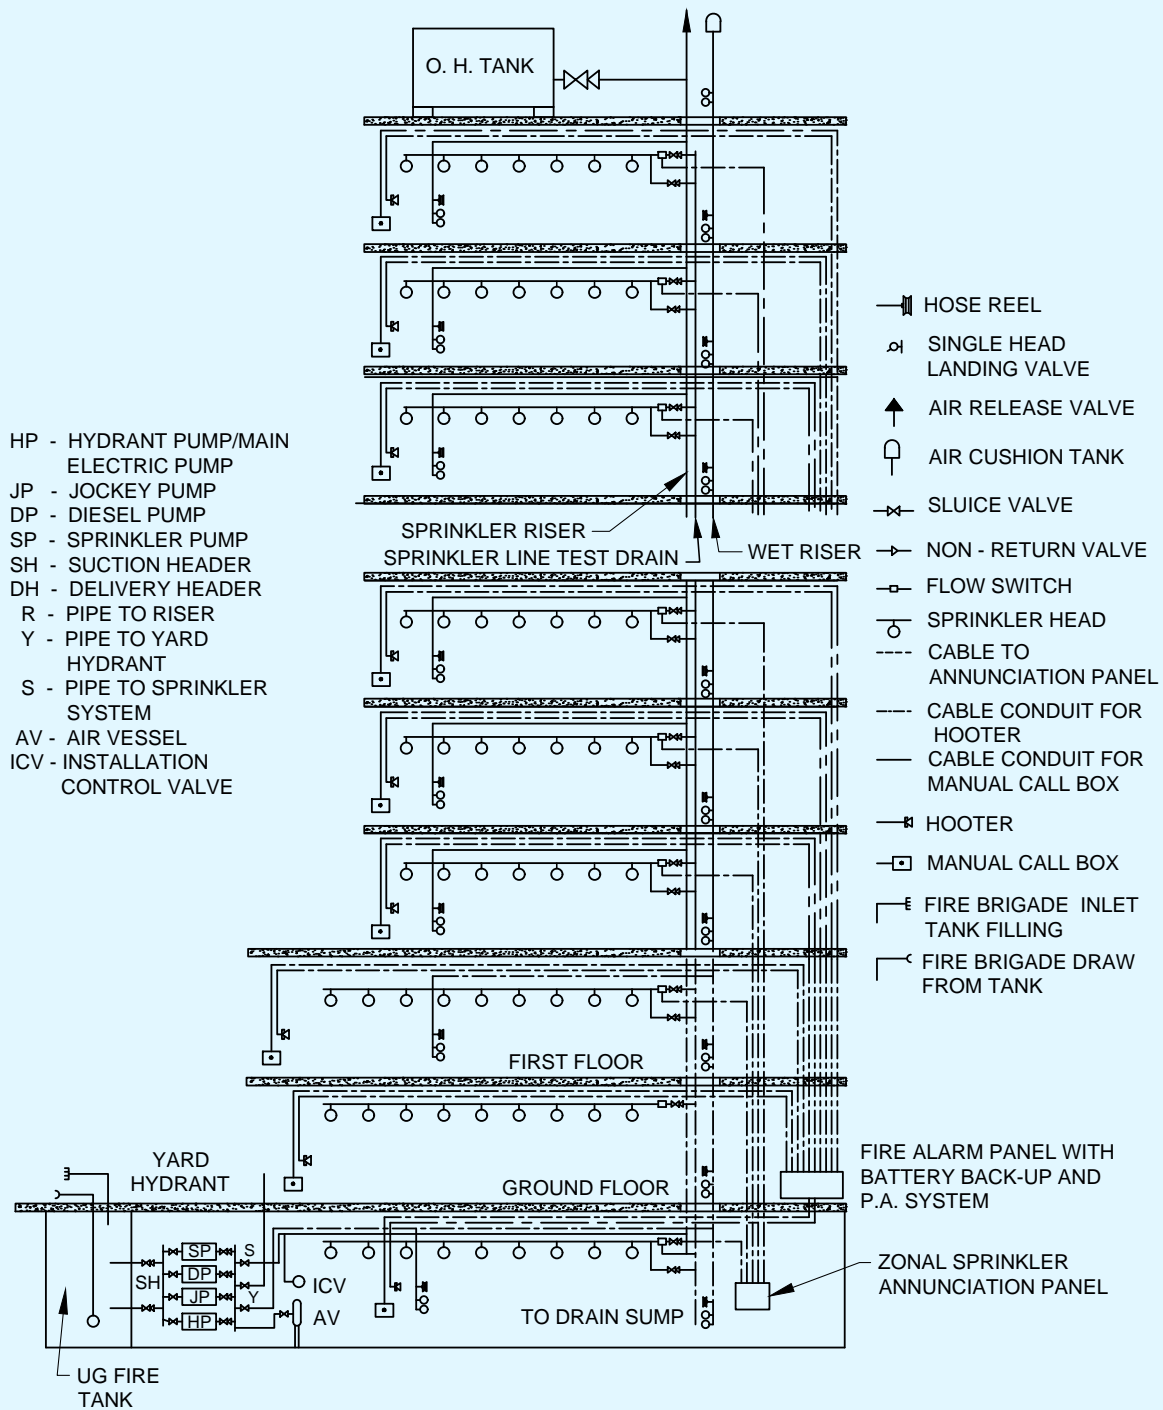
TYPICAL ARRANGEMENT OF WET RISER AND TOTAL SPRINKLER SYSTEM OF BUILDING
